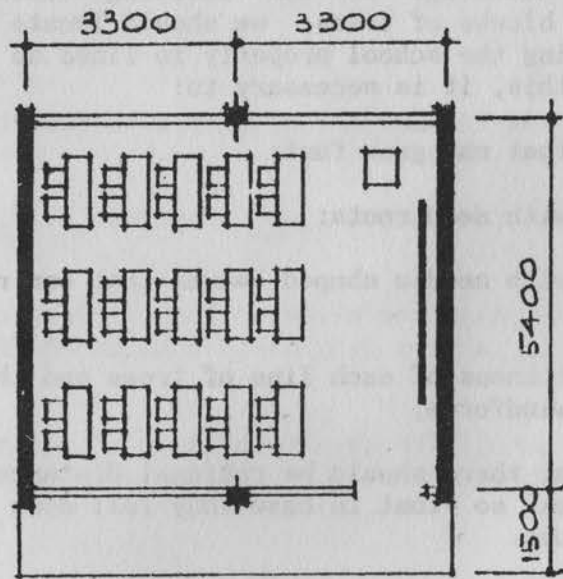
Small-sized classrooms (30 seats) restricting typhoon damages.
